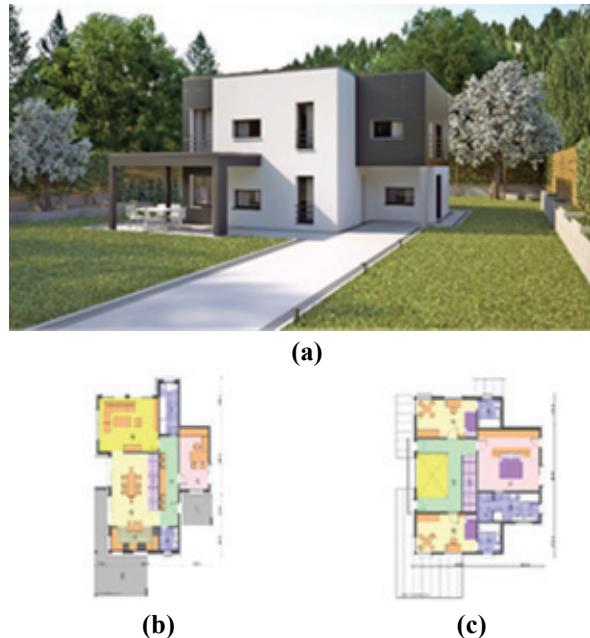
Geometry of MODEL FW0: (a) 3D representation; (b) ground floor base; (c) first floor base (Prefabricated house, 2022)
